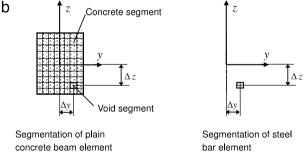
Segmentation of plain concrete beam and reinforcing steel bar elements.
